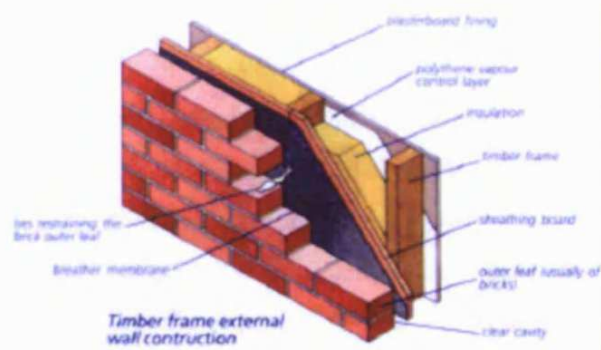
Typical external wall construction (timber frame) (NHBC, 2000)
